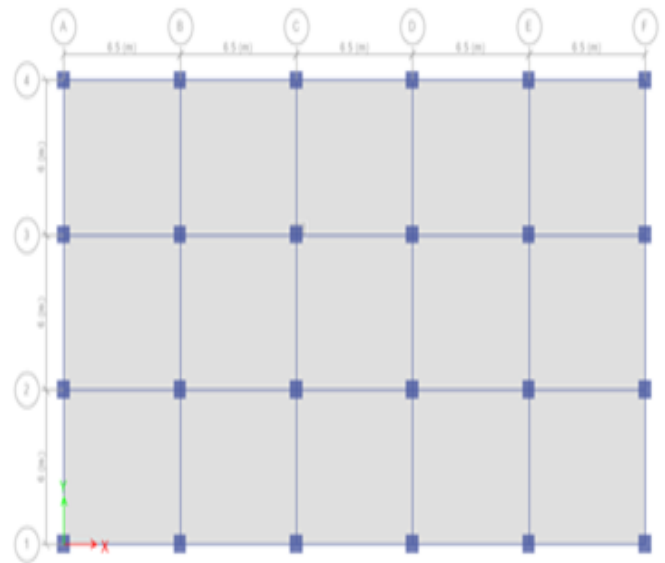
Model 1 – Floor plan of the structure without shear wall.
